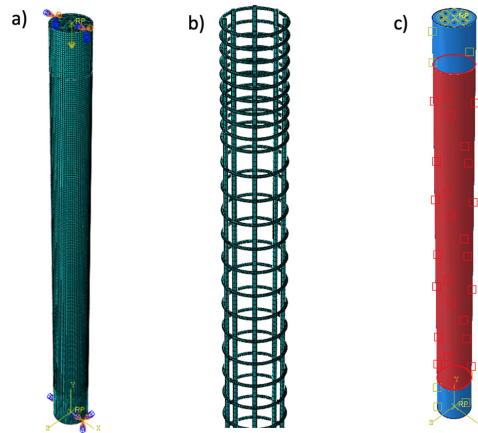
Columns' numerical representation in Abaqus – specimen with BFRP main reinforcement, a) concrete mesh (c3d8t finite elements, 15 mm), b) reinforcement bars (c3d8t finite elements, 15 mm), c) heated part
